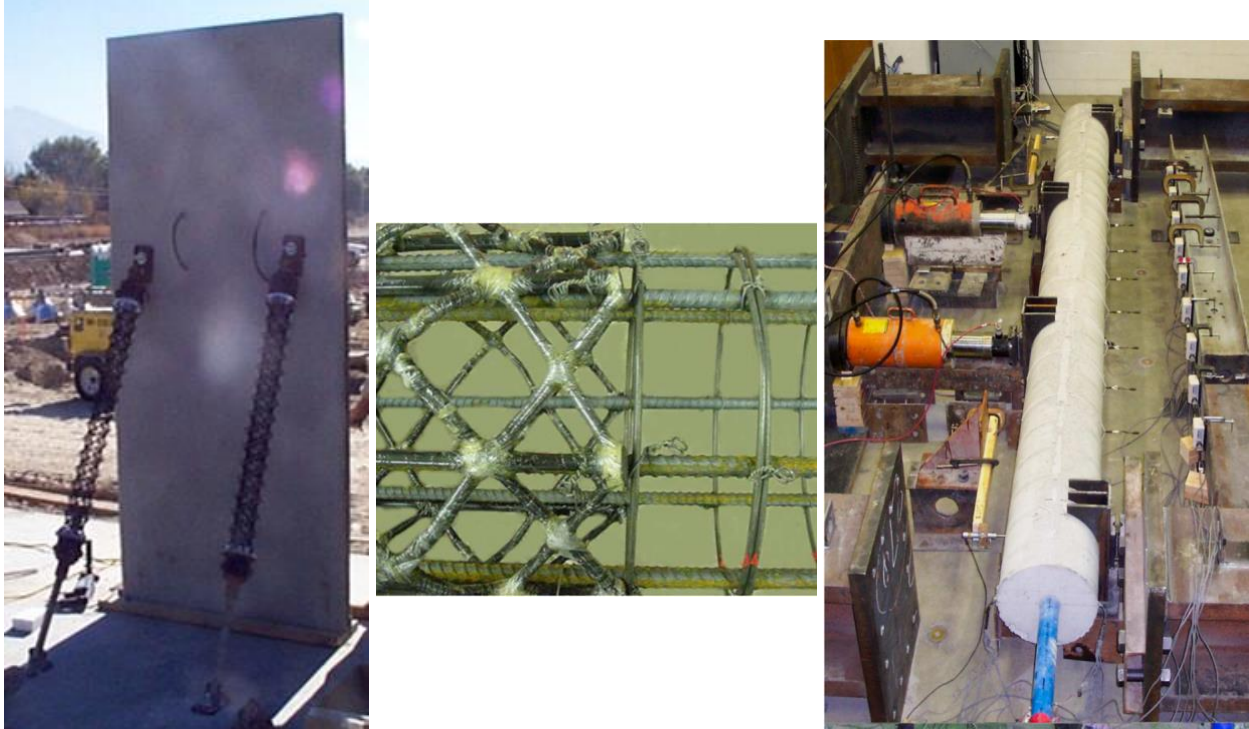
IsoTruss geometry for construction applications: wall braces (left), concrete reinforcement replacing steel (middle), concrete pile (right)¹⁷. The strength-to-weight ratio and durability in extreme weather conditions allow IsoTruss structures to outperform steel in numerous applications.
